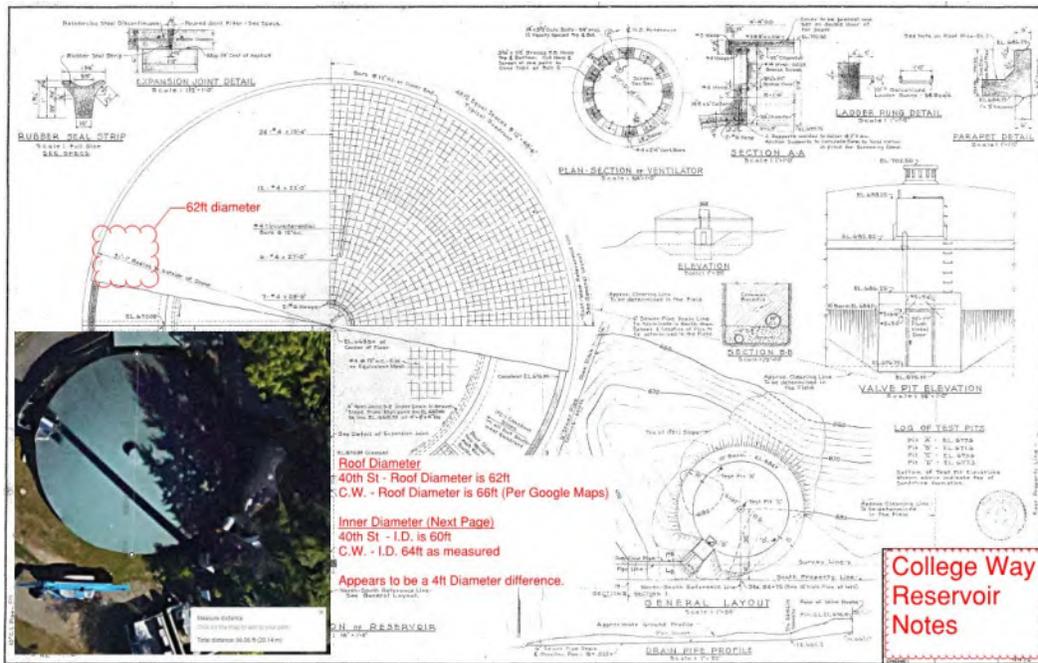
College Way Reservoir Plans and Elevations (Drawings are based on 40th St)
